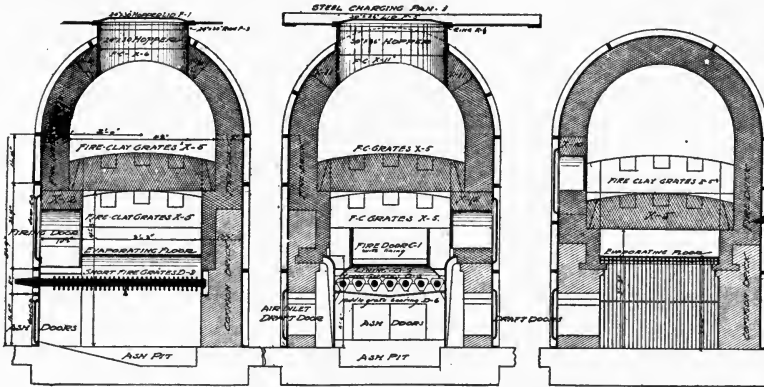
CROSS-SECTION SMITH INCINERATOR.
